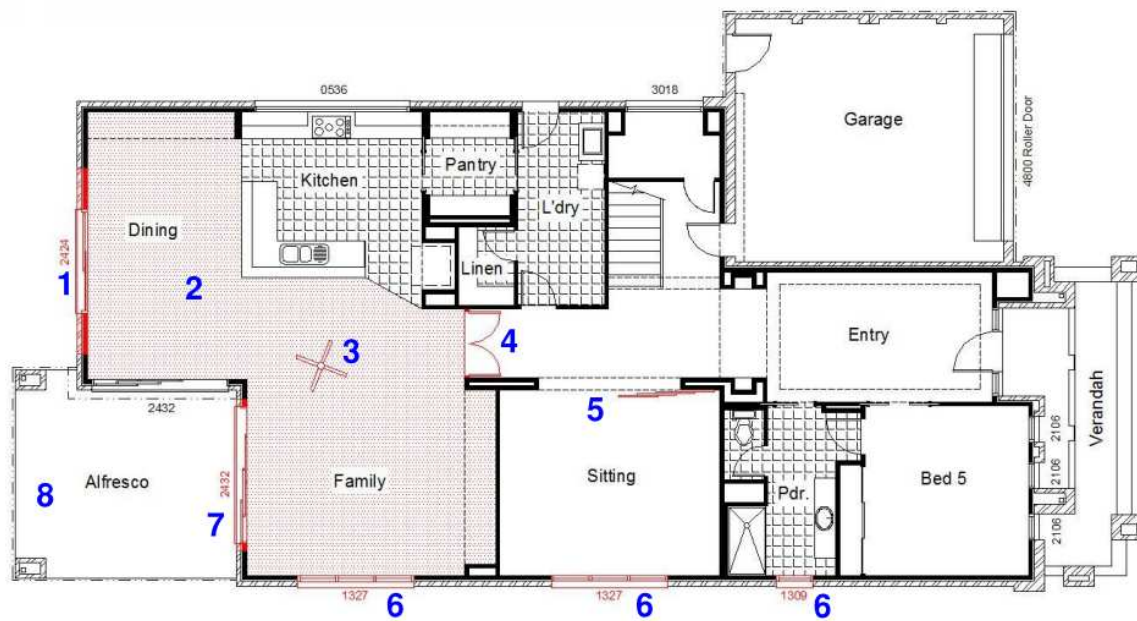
Redesigned ground floor plan for Dwelling 12 in Adelaide, Brisbane, Canberra, Hobart and Melbourne.
